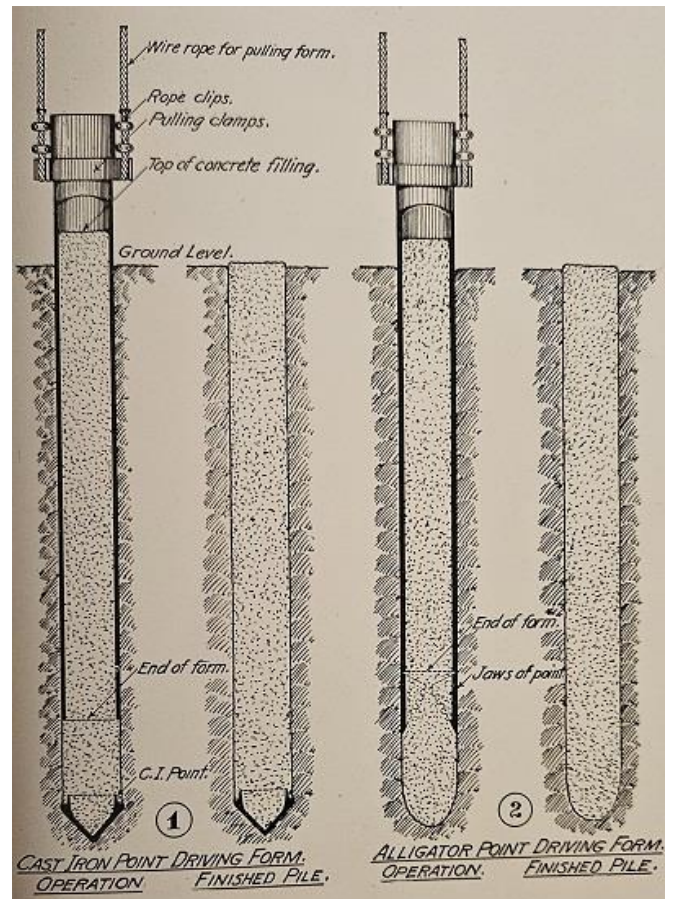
Diagram of the Simplex Concrete Piling Co.'s process for installing its cast-in-place piles. Source: Simplex (1907).
